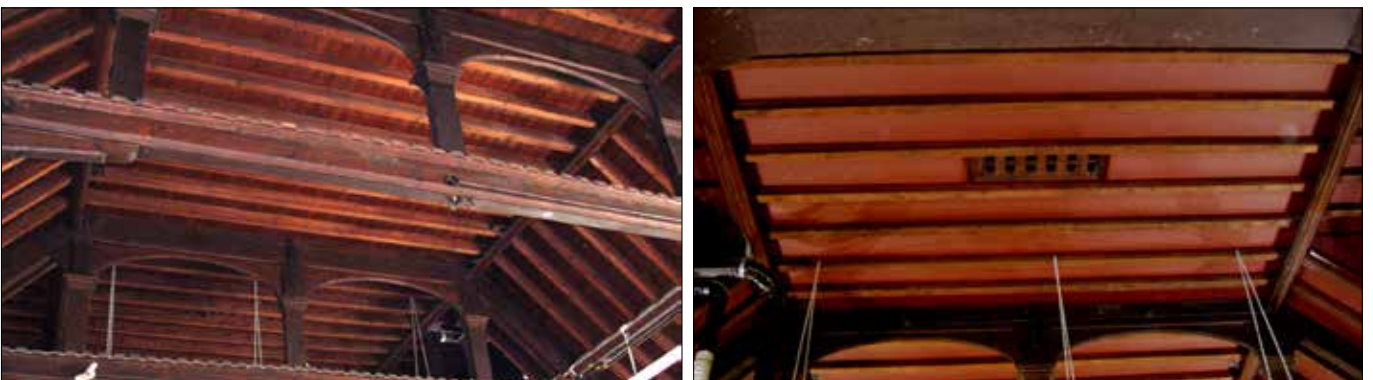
Main hall ceiling before and after installing insulation between the rafters
